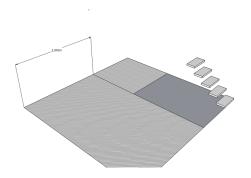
Lets suppose that at this stage of the design process, the designer will attribute a measure. He chooses the height dimensions.
